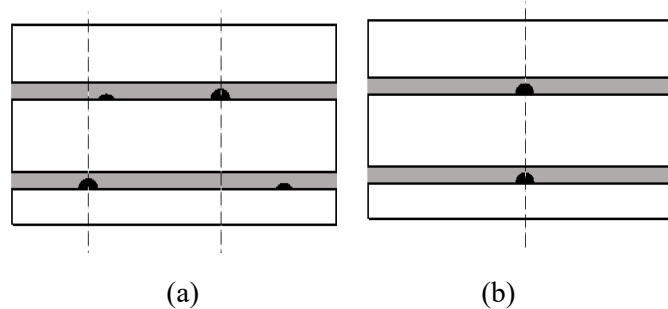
Modeling approach (example of a beam element containing two bars)
